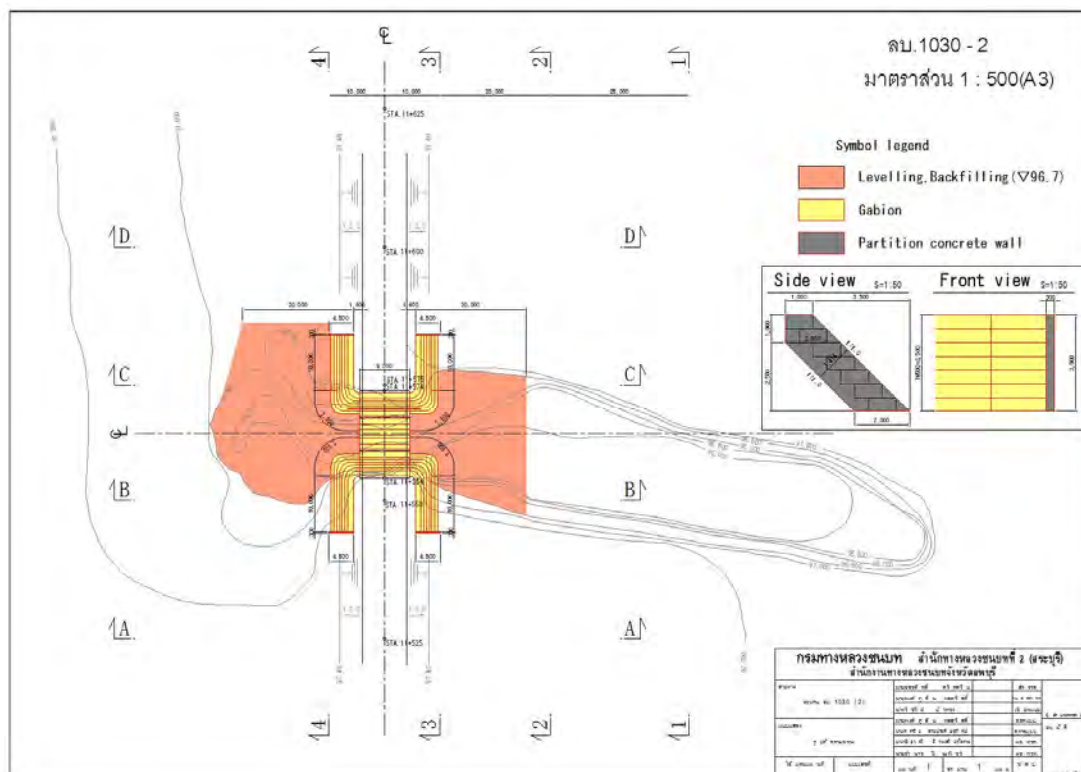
Design drawing of rehabilitation plan (Bridge 1030-2)
